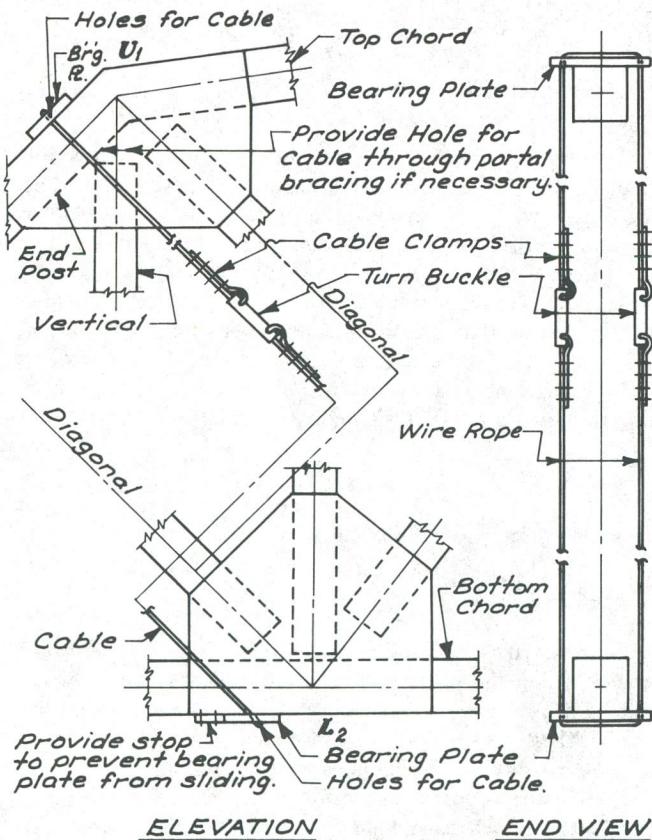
Auxiliary support for repair of truss diagonal, tension member.
